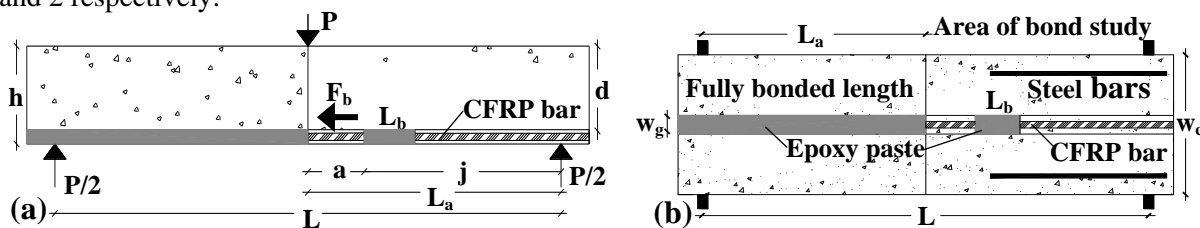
Geometrical characteristics of beam specimens: (a) side view and (b) plan view.
